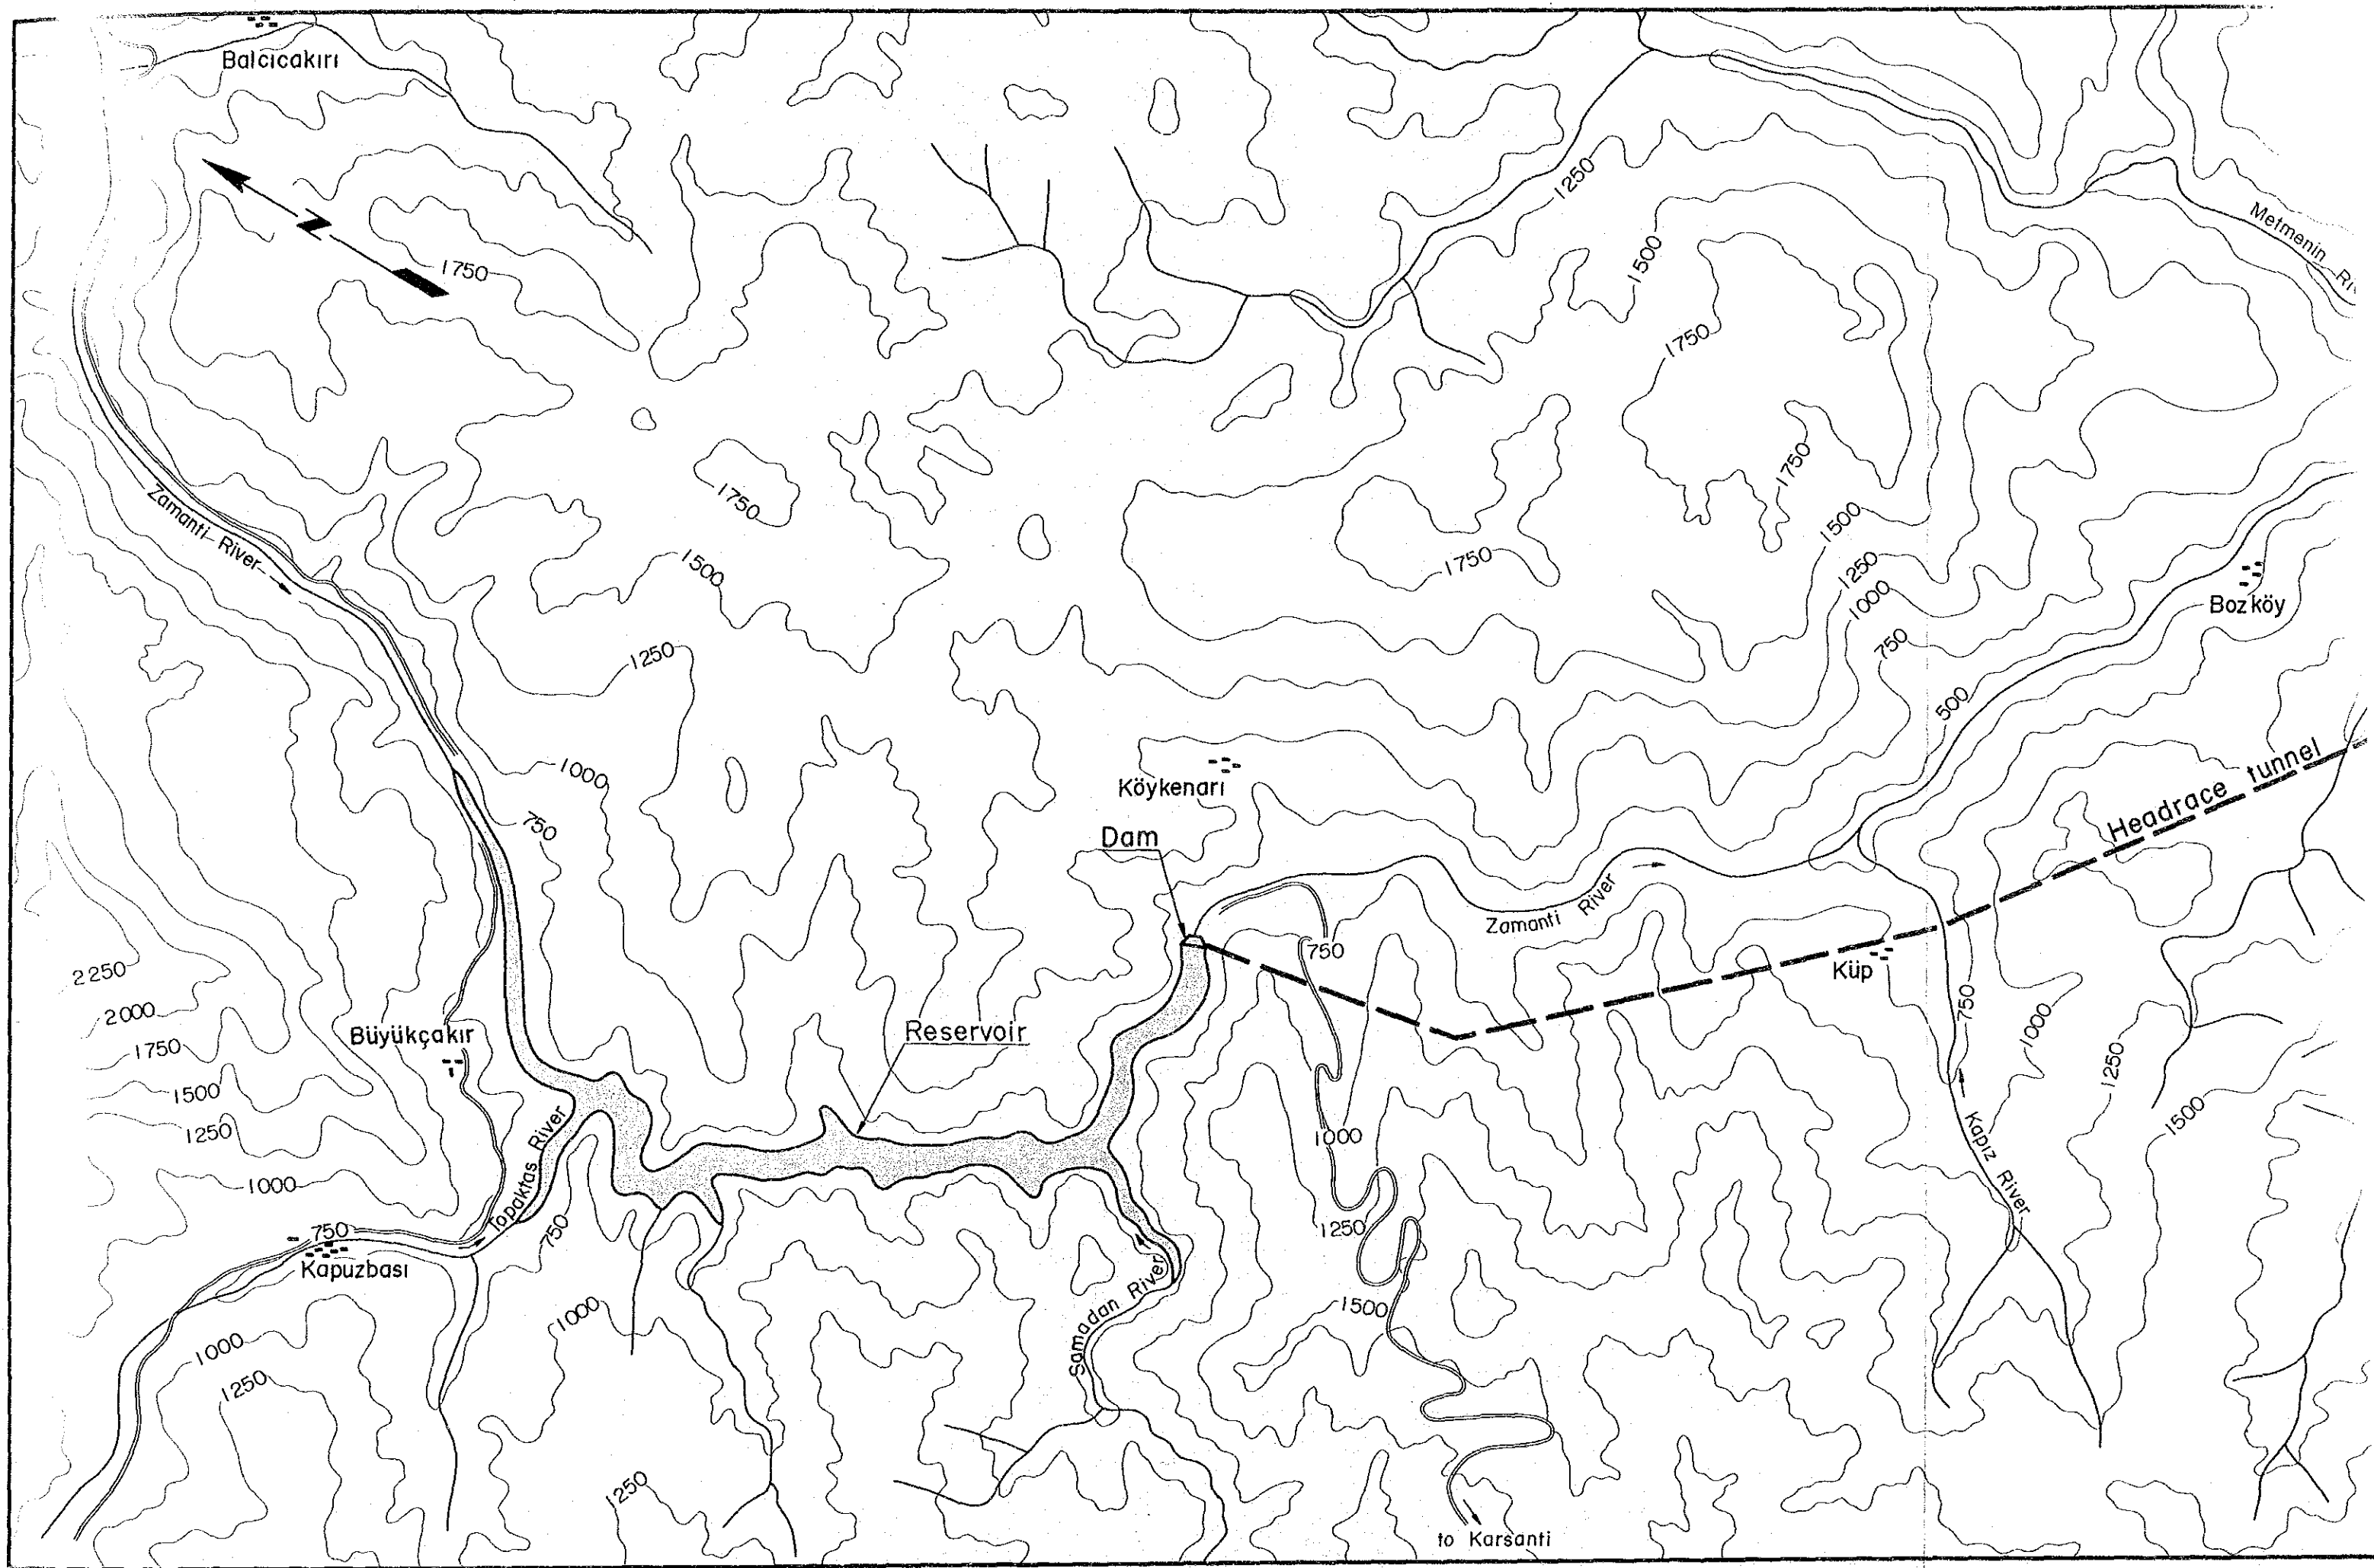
GENERAL PLAN OF THE UPPER SEYHAN MASTER PLAN
